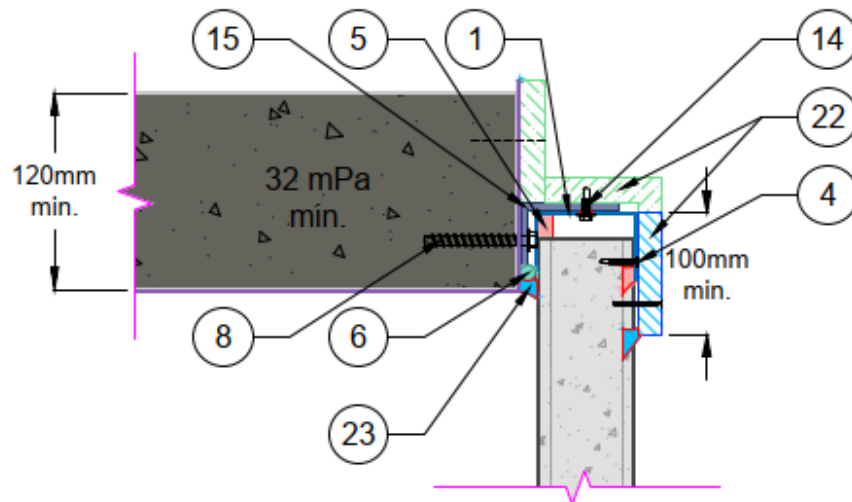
Head – vertical or horizontal wall connected to stringer via structural support (section view)
